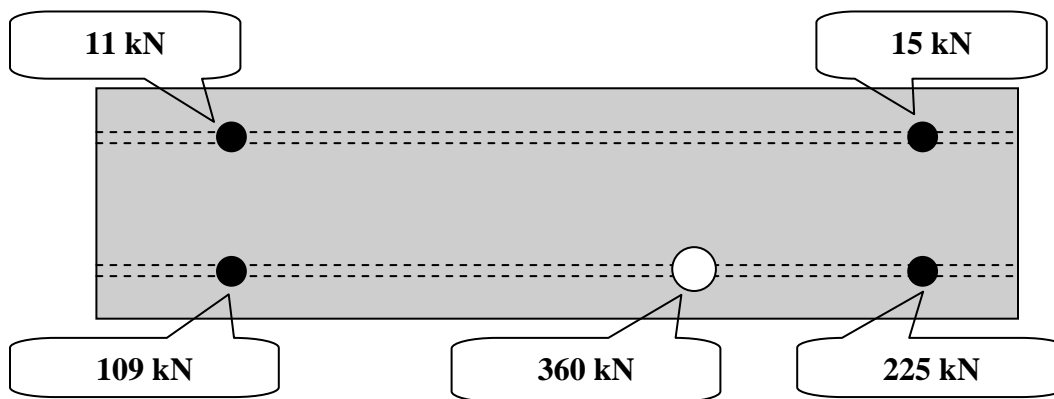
Illustration. Load and reactions for Girder P4-21S at 360 kN (81 kips) of load.
